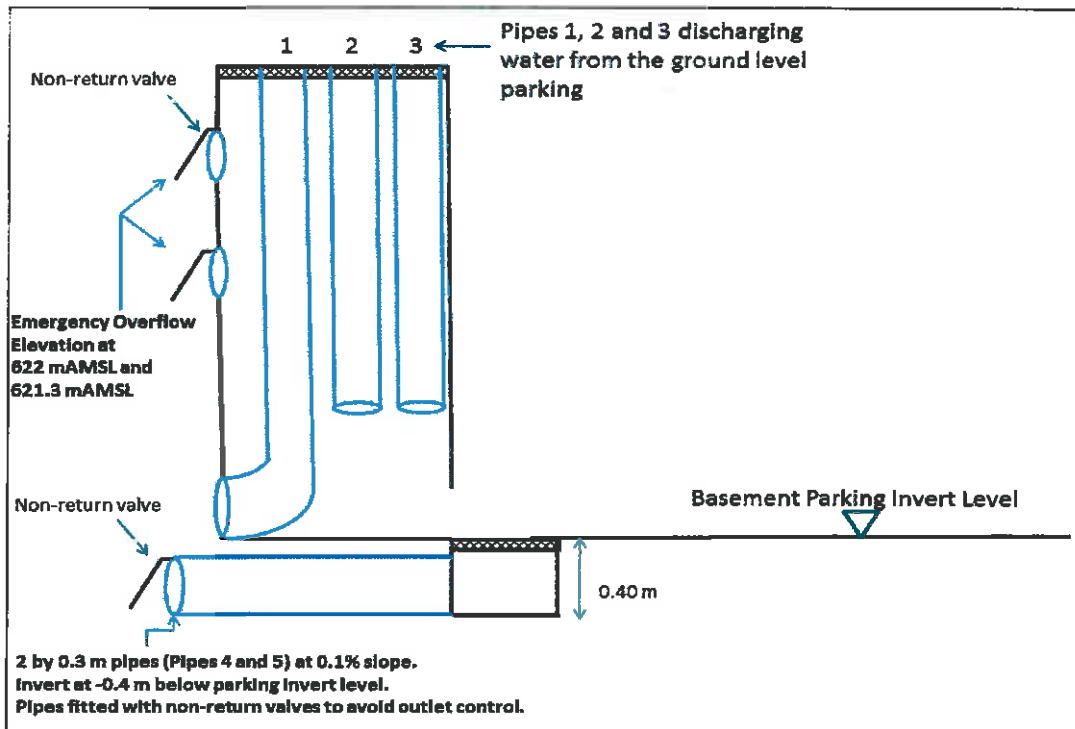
Conceptual Long Section Schematic of the Basement Level Sump, Catch Pit and Stormwater Diversion Pipes.
